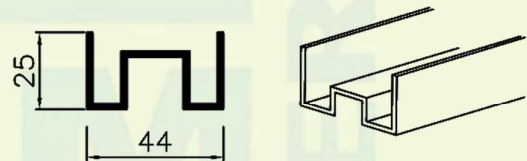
DETAILS PROFILES OF THE GEG ECO LIGHTWEIGHT PANEL SYSTEM
